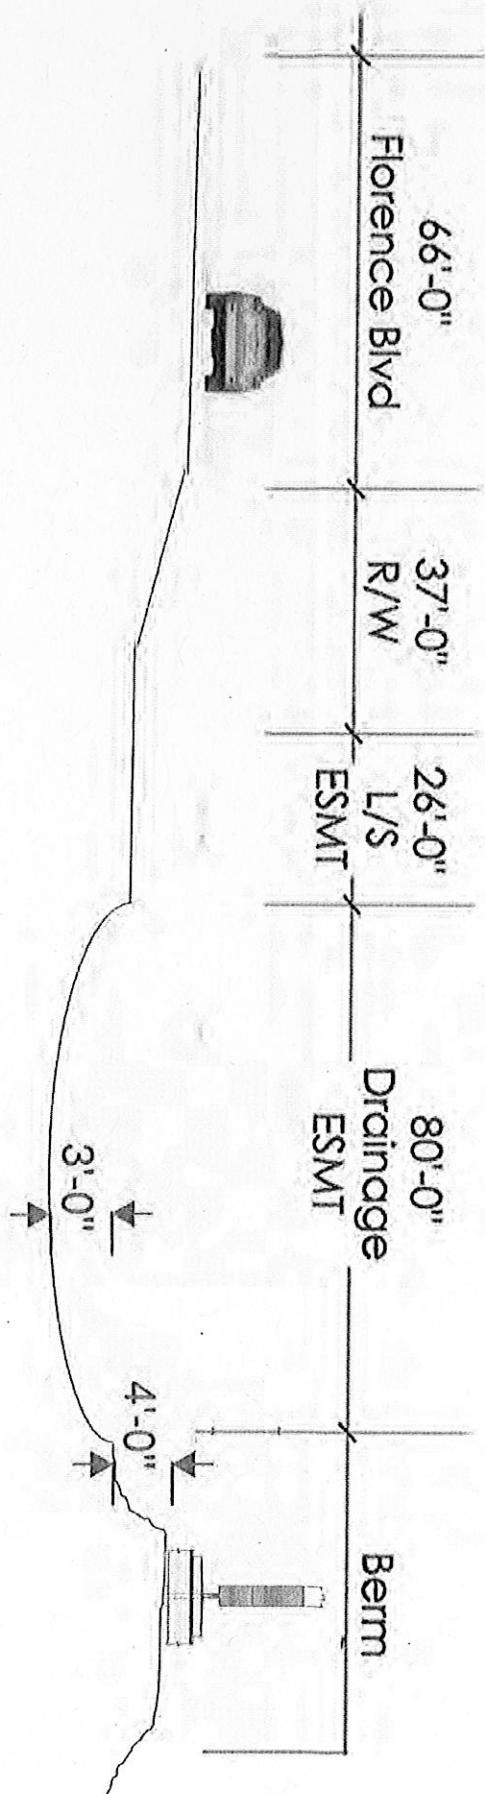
Site Plan of Proposed Phoenix Mart Sculptural Logo
